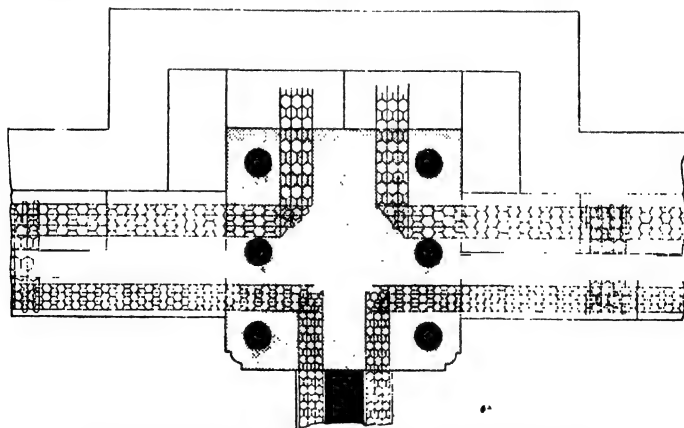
Reinforced Brickwork Walls (Brown System.)
